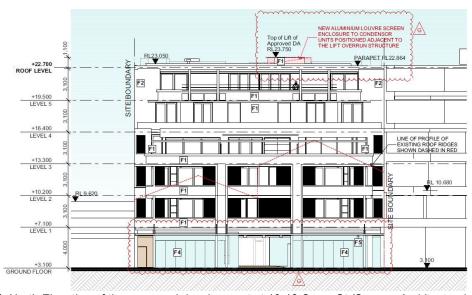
North Elevation of the approved development at 16-18 Cross St (Source: Architectural drawing – Section 4.55 Issue DA17 Rev G by Cottee Parker Architects)
